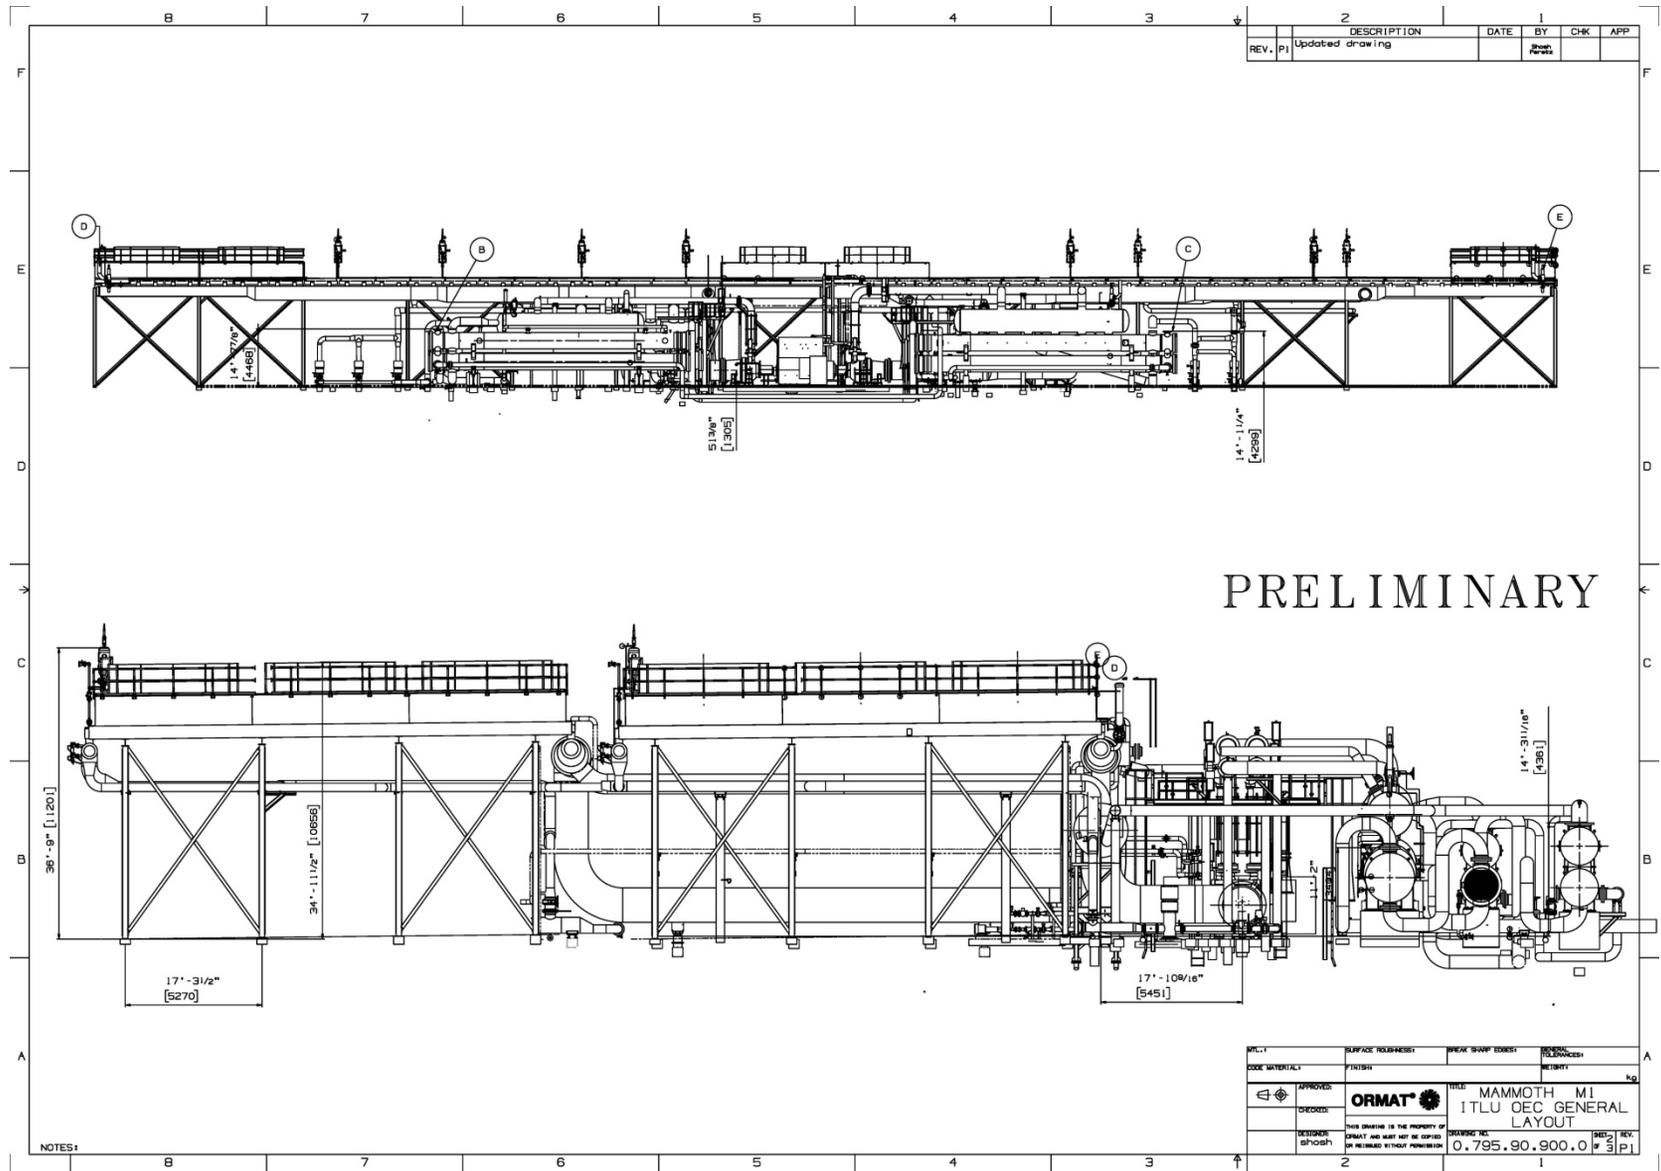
Elevation View of the Proposed M-1 Replacement Plant ITLU OEC Facilities
